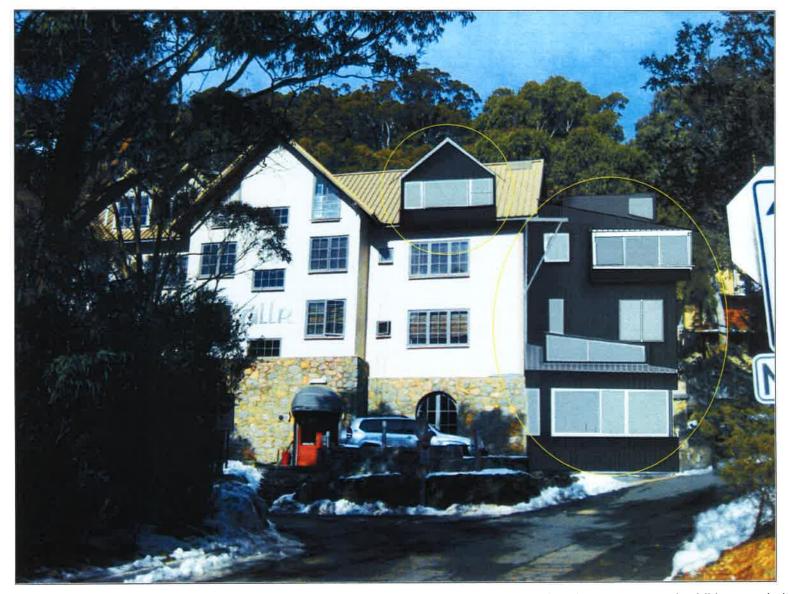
Photomontage of proposal looking towards the western façade of House of Ullr illustrating the new external additions and alterations (circled) (Source: Applicant's DA documentation)
